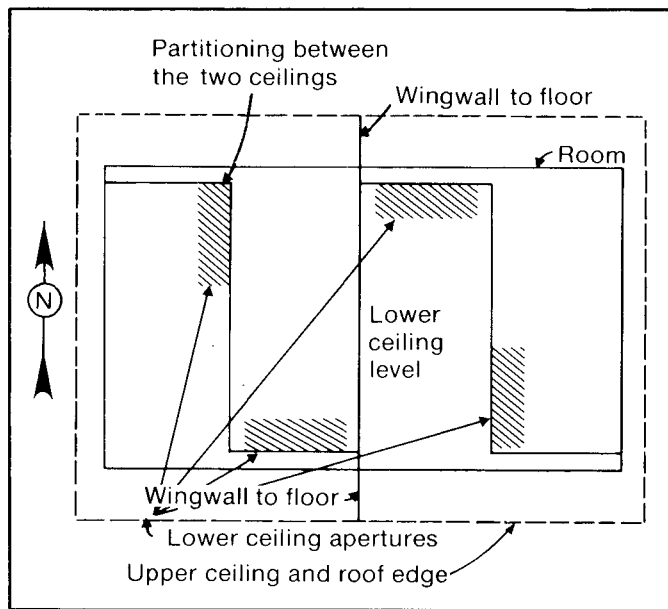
Plan View of Windowless Double-Ceiling Ventilator
